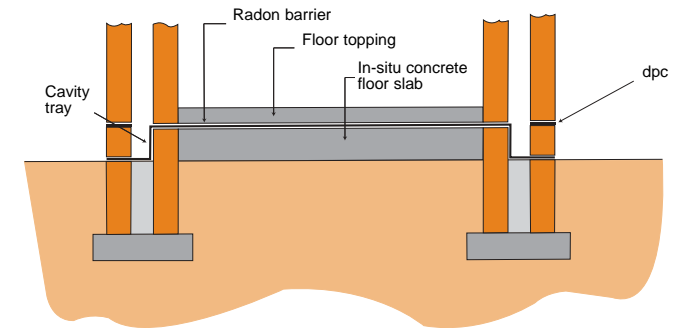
Figure A: Enhanced damp-proof membrane providing basic radon protection to an in-situ or ground-supported concrete floor with barrier placed over the slab
